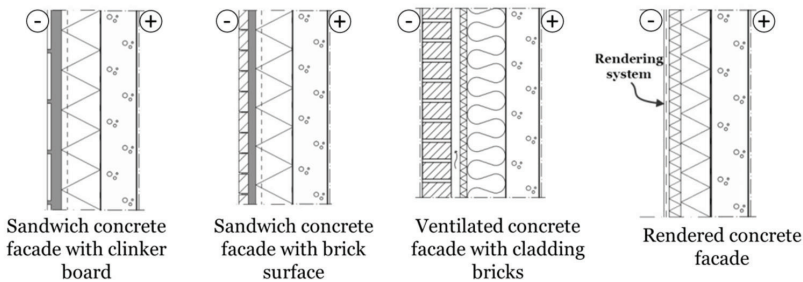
Examples of concrete building facades fabricated in Finland.
